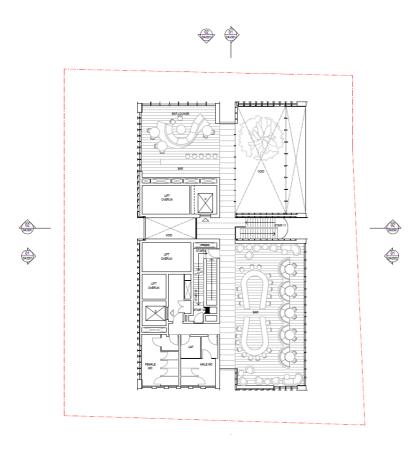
| Proposed level 58 (Source: Woods Bagot)
